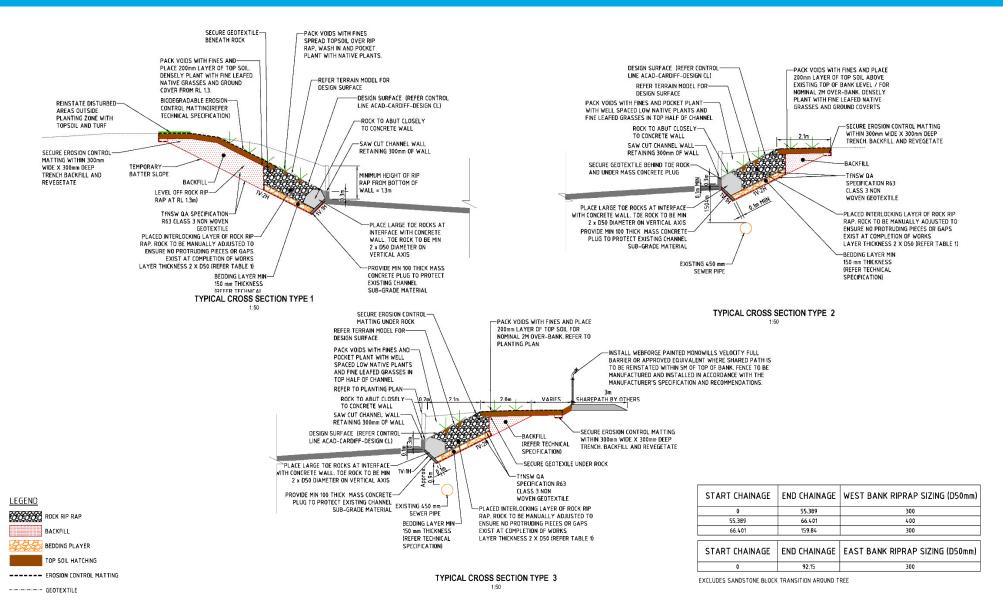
Winding Creek South of Myall Road, Cardiff: Typical Cross-Sections
